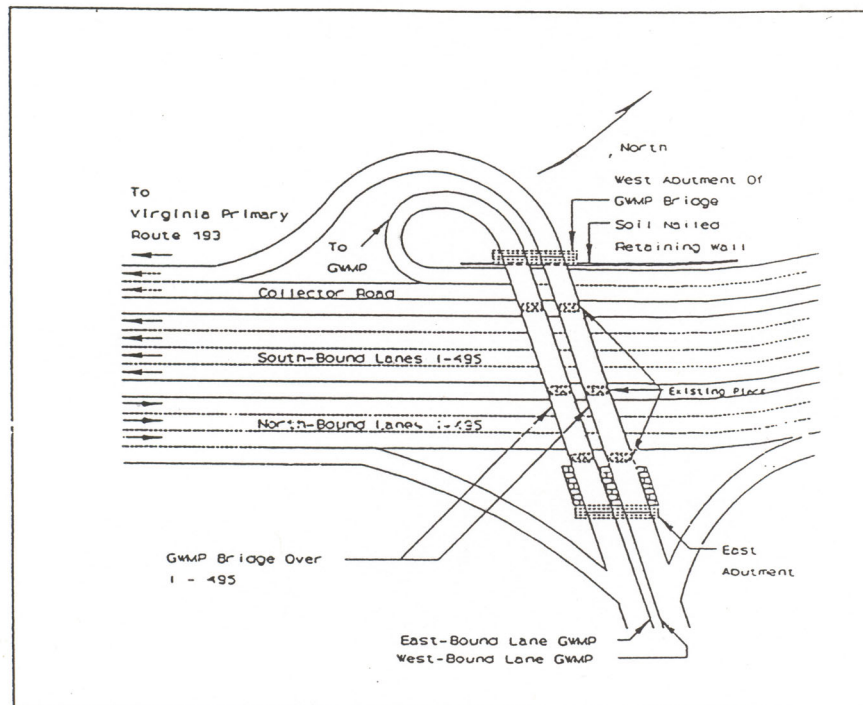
Plan View of Project Location after Construction of Soil Nailed Retaining Wall.
